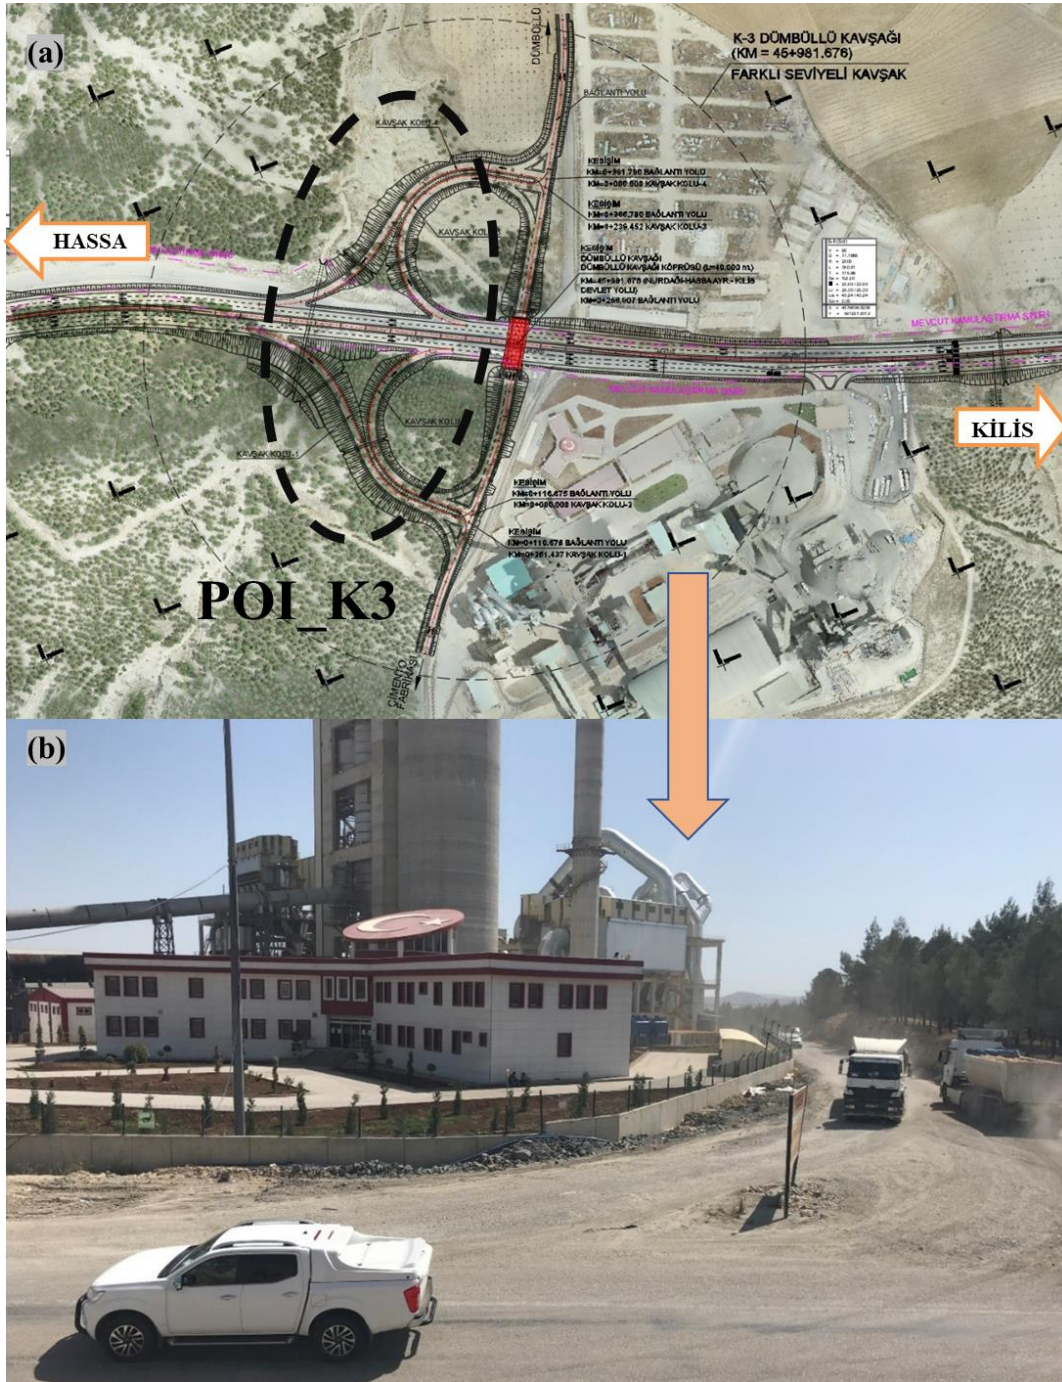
(a) POI_K3 Dümbüllü Junction area general layout at St. Km: 45+981.676 (b) Cement plant at St. Km: 45+980
